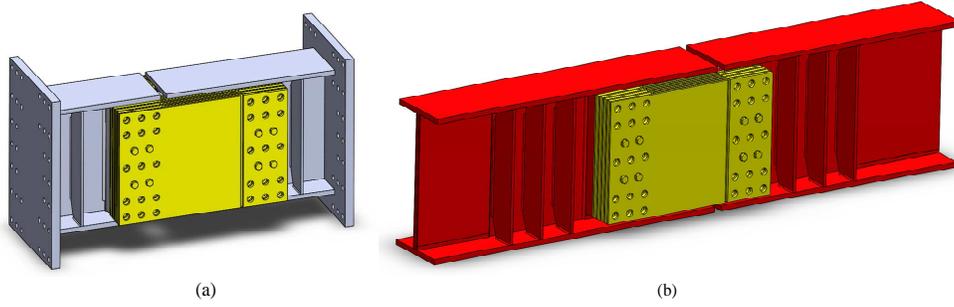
Full-scale outrigger VCD specimens (a) replaceable end plate VCD-R (b) concrete wall embedded VCD-E
